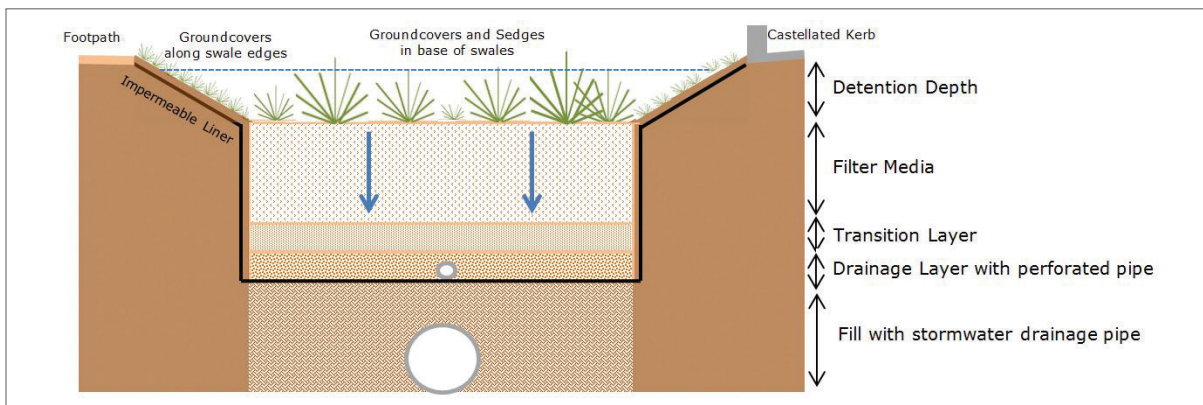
Indicative Cross Section, Road Side Biofiltration Swale
